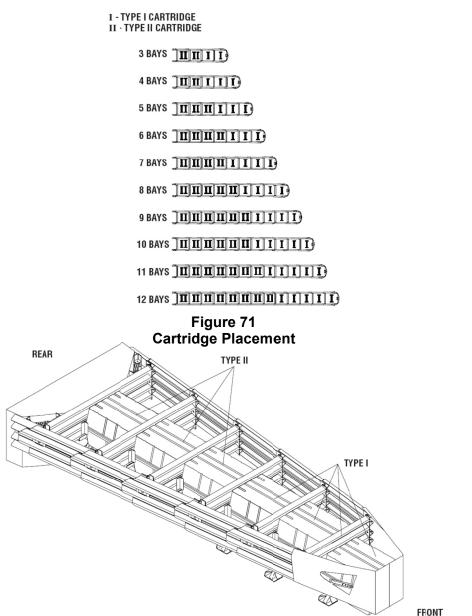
Typical Cartridge Layout (5 Bay System Shown)
